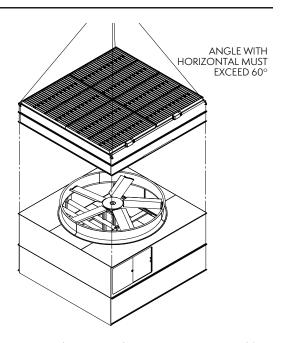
Mating Discharge Hood Damper Section to Coil/Fan Section
